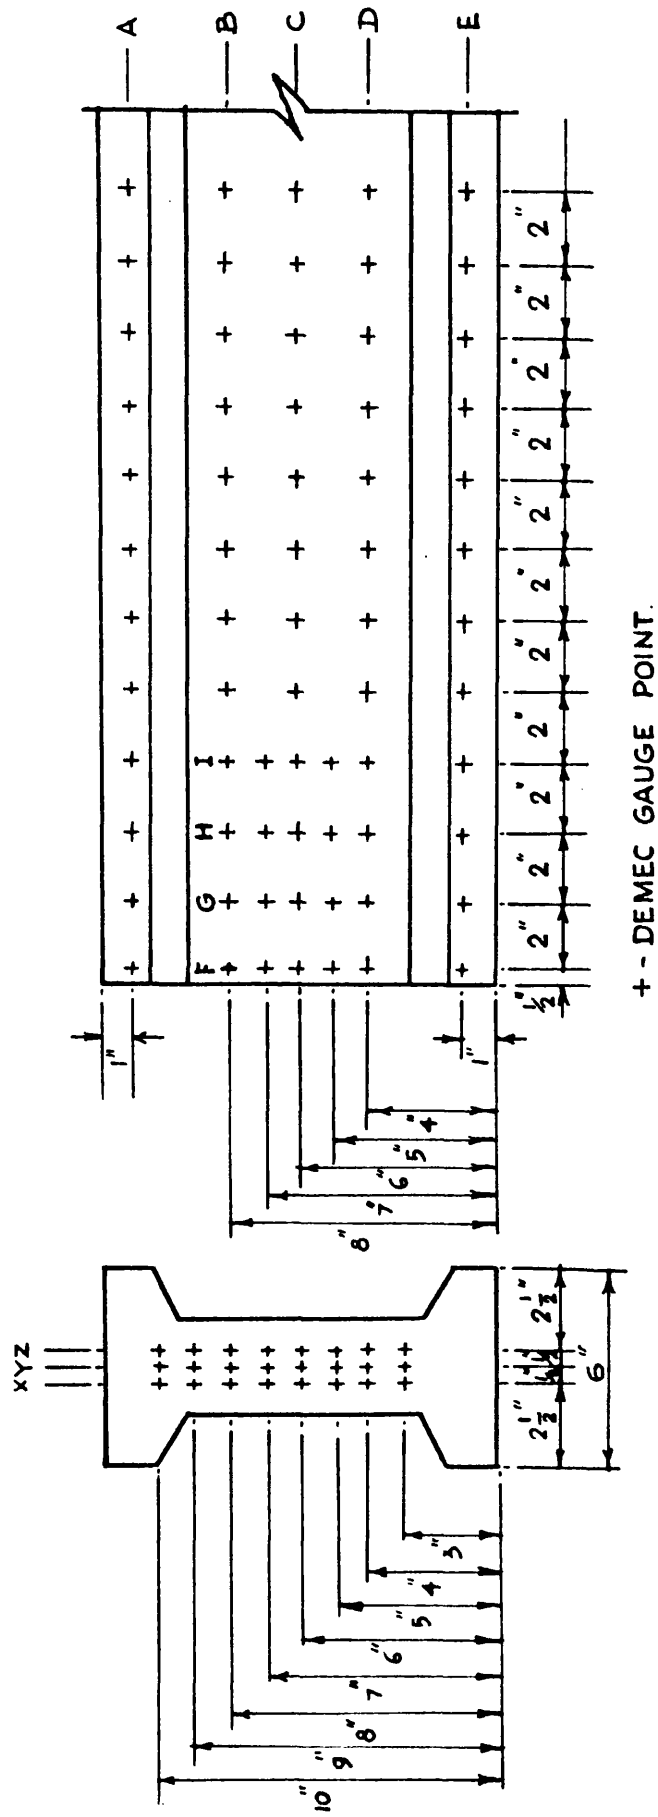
TYPICAL ARRANGEMENT OF GAUGE POINTS.
